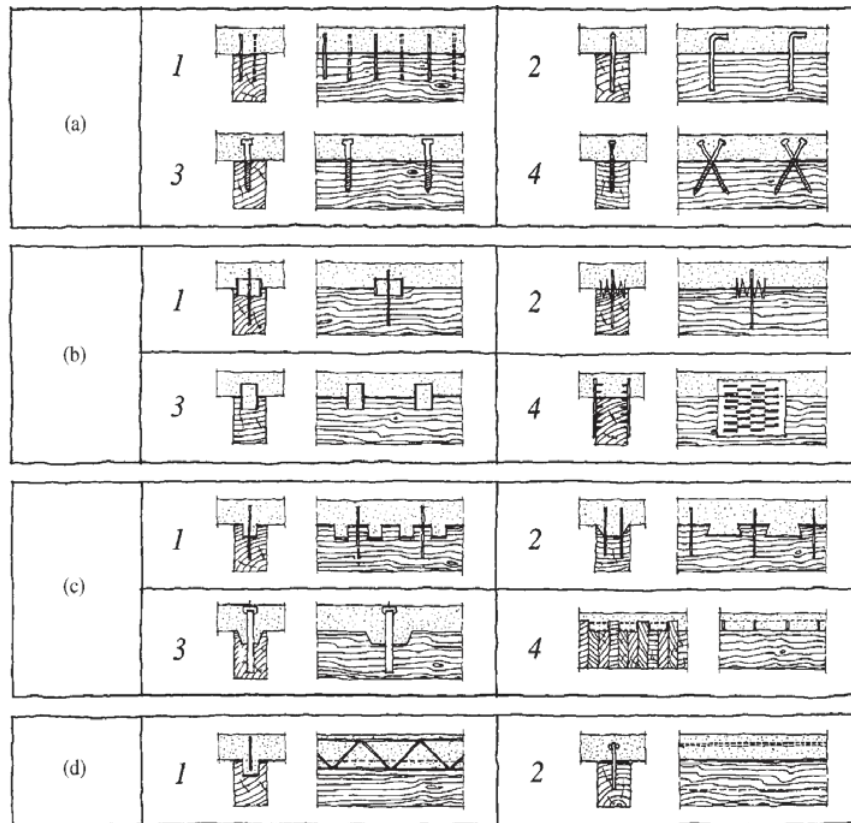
(a): 5 Examples of concrete–timber connections (Ceccotti, 1995) : (a1) nails; (a2) glued reinforced concrete steel bars; (a3/4) screws; (b1/2) connectors (split rings and toothed plates); (b3) steel tubes; (b4) steel punched metal plates; (c1) round indentations in timber, with fasteners preventing uplift; (c2) square indentations, ditto; (c3) cup indentation and prestressed steel bars; (c4) nailed timber planks deck and steel shear plates slotted through the deeper planks; (d1) steel lattice glued to timber; (d2) steel plate glued to timber
